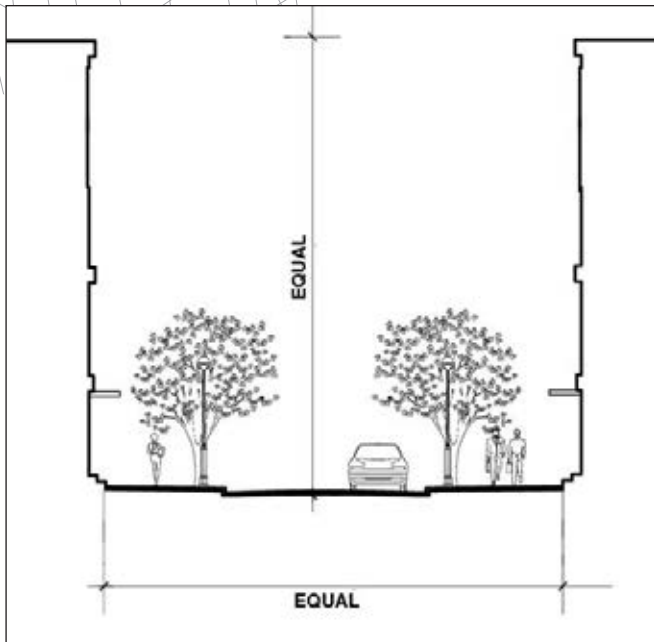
Typical street cross-section showing a 1:1 relationship between street wall height and right-of-way (ROW) width
